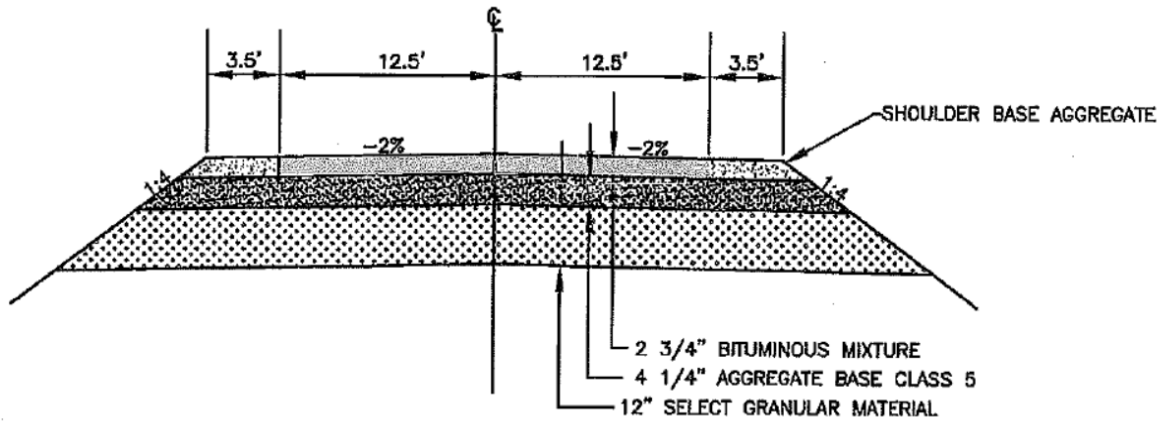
Hubbard CSAH 46 Existing Typical Section
